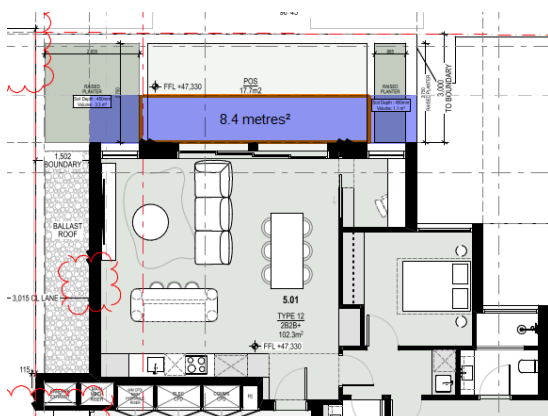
Excerpt of the floor plan for apartment 5.01- Council Officers have overlaid the potential area for the balcony in purple
